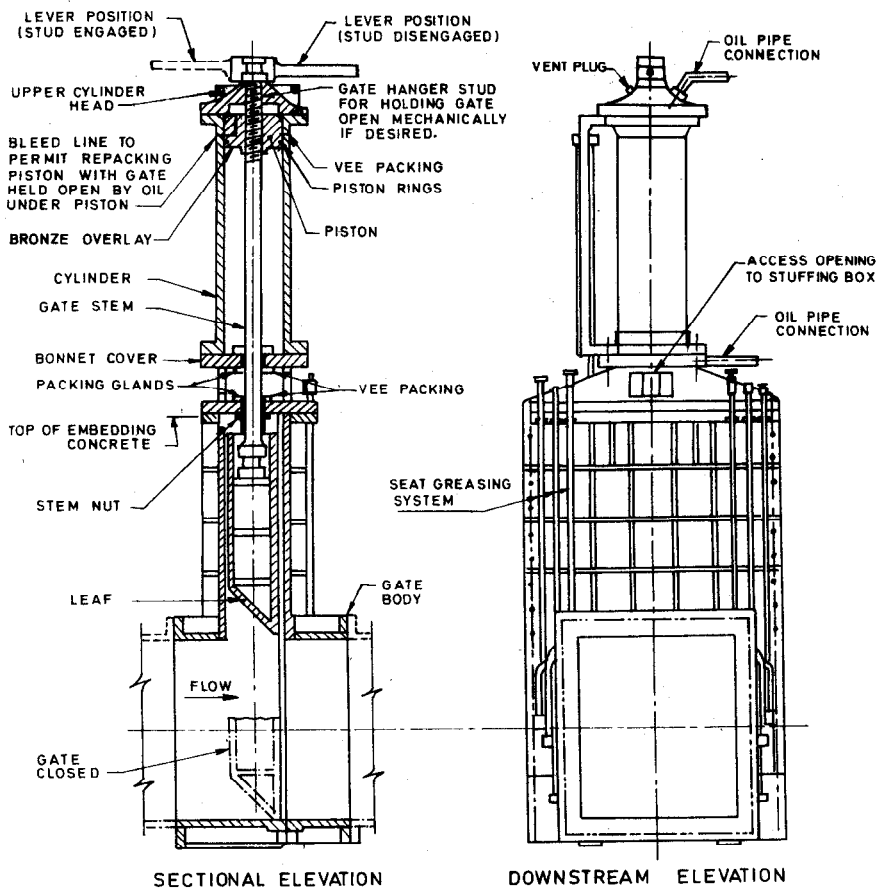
TYPICAL ARRANGEMENT OF HYDRAULIC HOIST FOR SLIDE GATE
